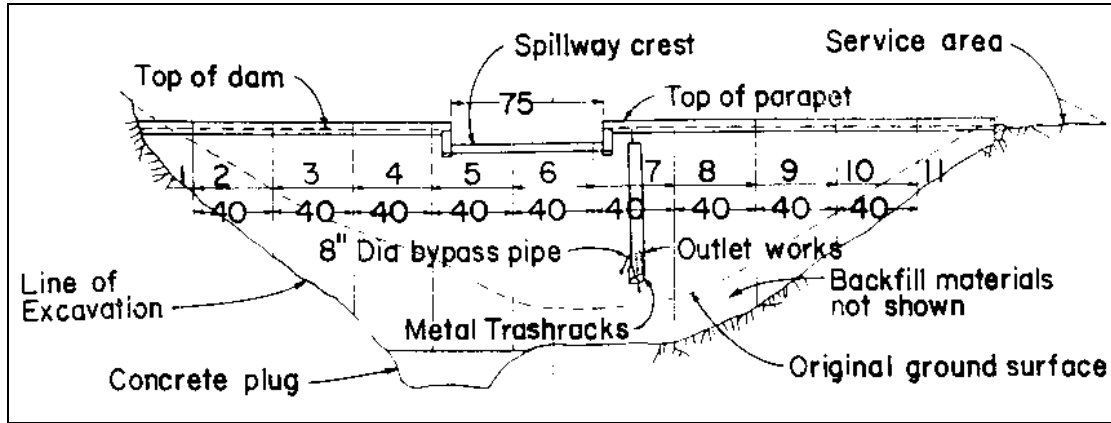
Upstream elevation of Wildhorse Dam. Note dental concrete (concrete plug) (USBR)
